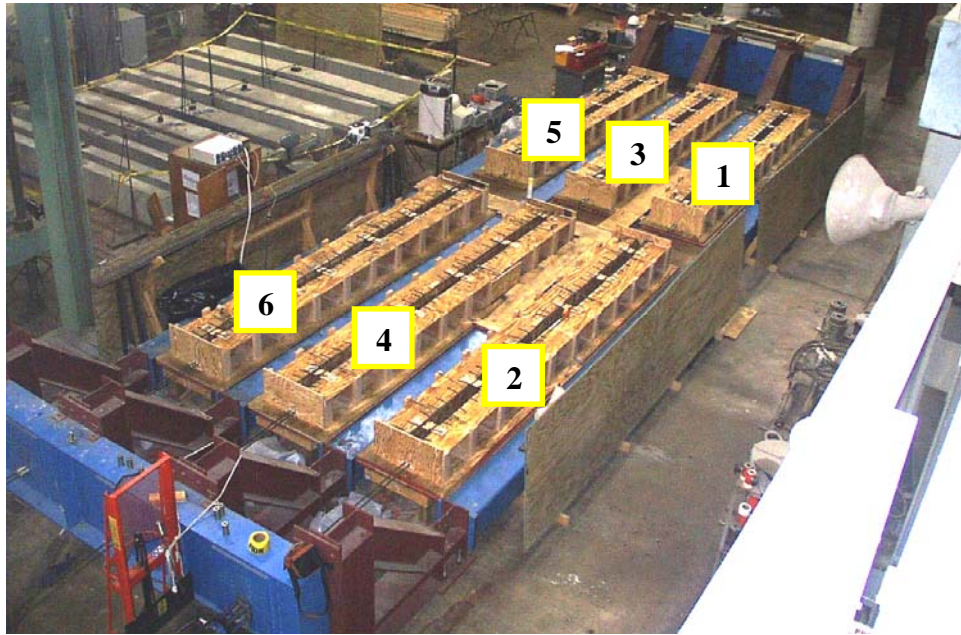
Prestressing Bed with Formwork at Ferguson Structural Engineering Laboratory Prior to Placement of Concrete
